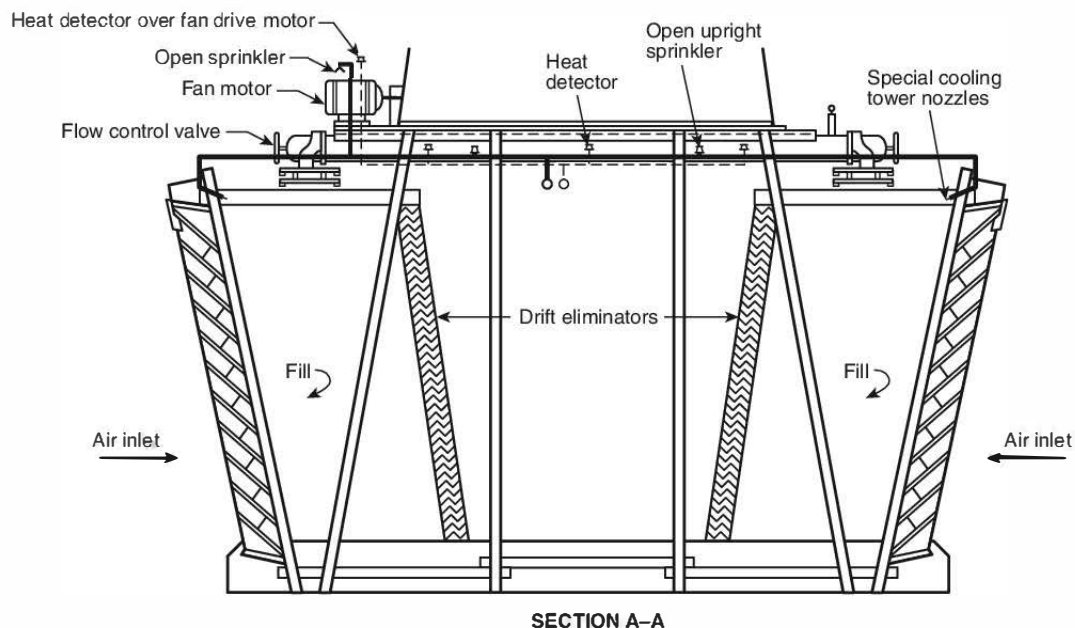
(b) Section View, Typical Deluge Fire Protection Arrangement for Crossflow Towers.
